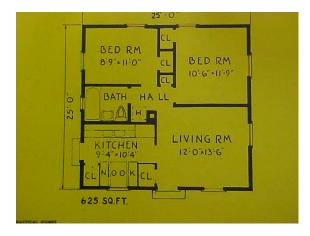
Typical floor plan, 1946.<sup>72</sup>
